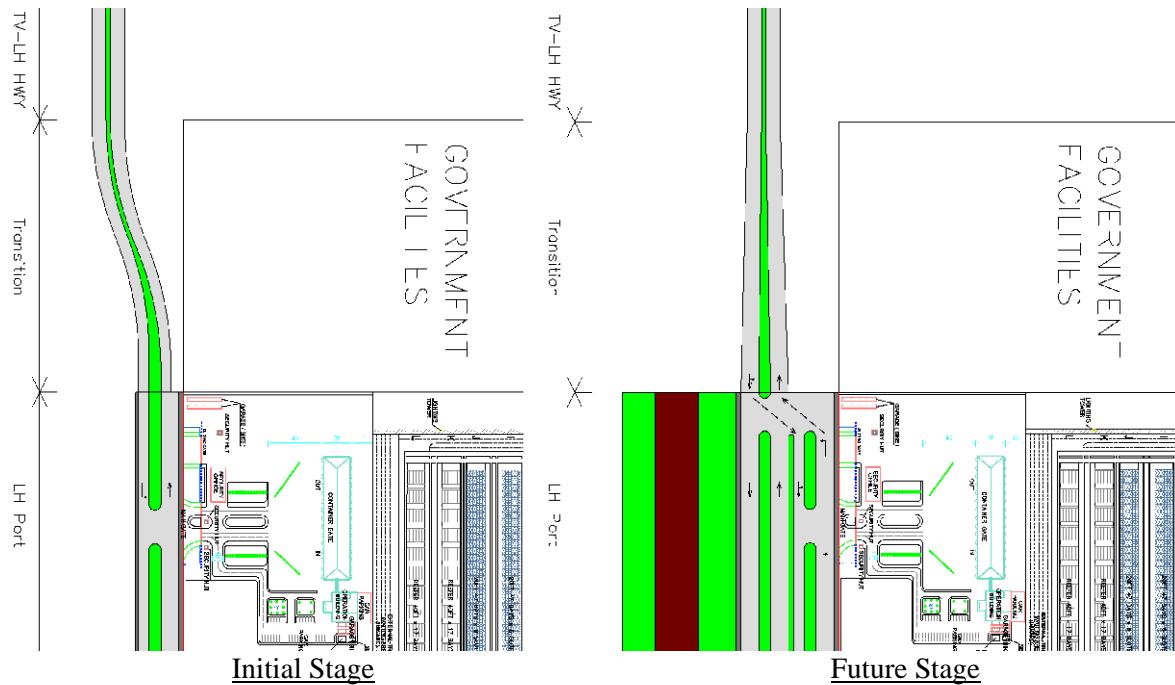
Transition between Tan Vu-Lach Huyen Highway and Port Road
